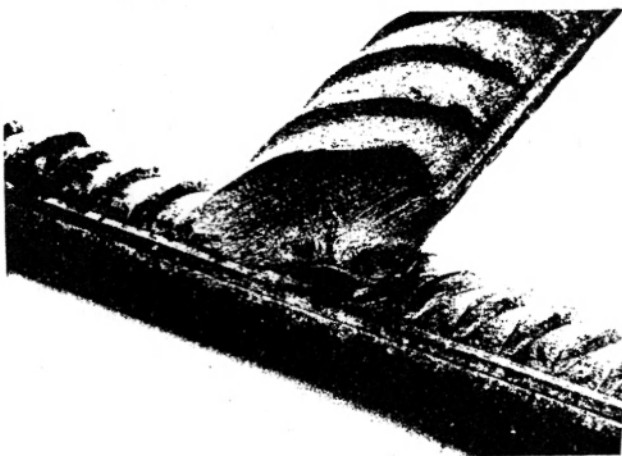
Tensile test. Ductile fracture in the weld
